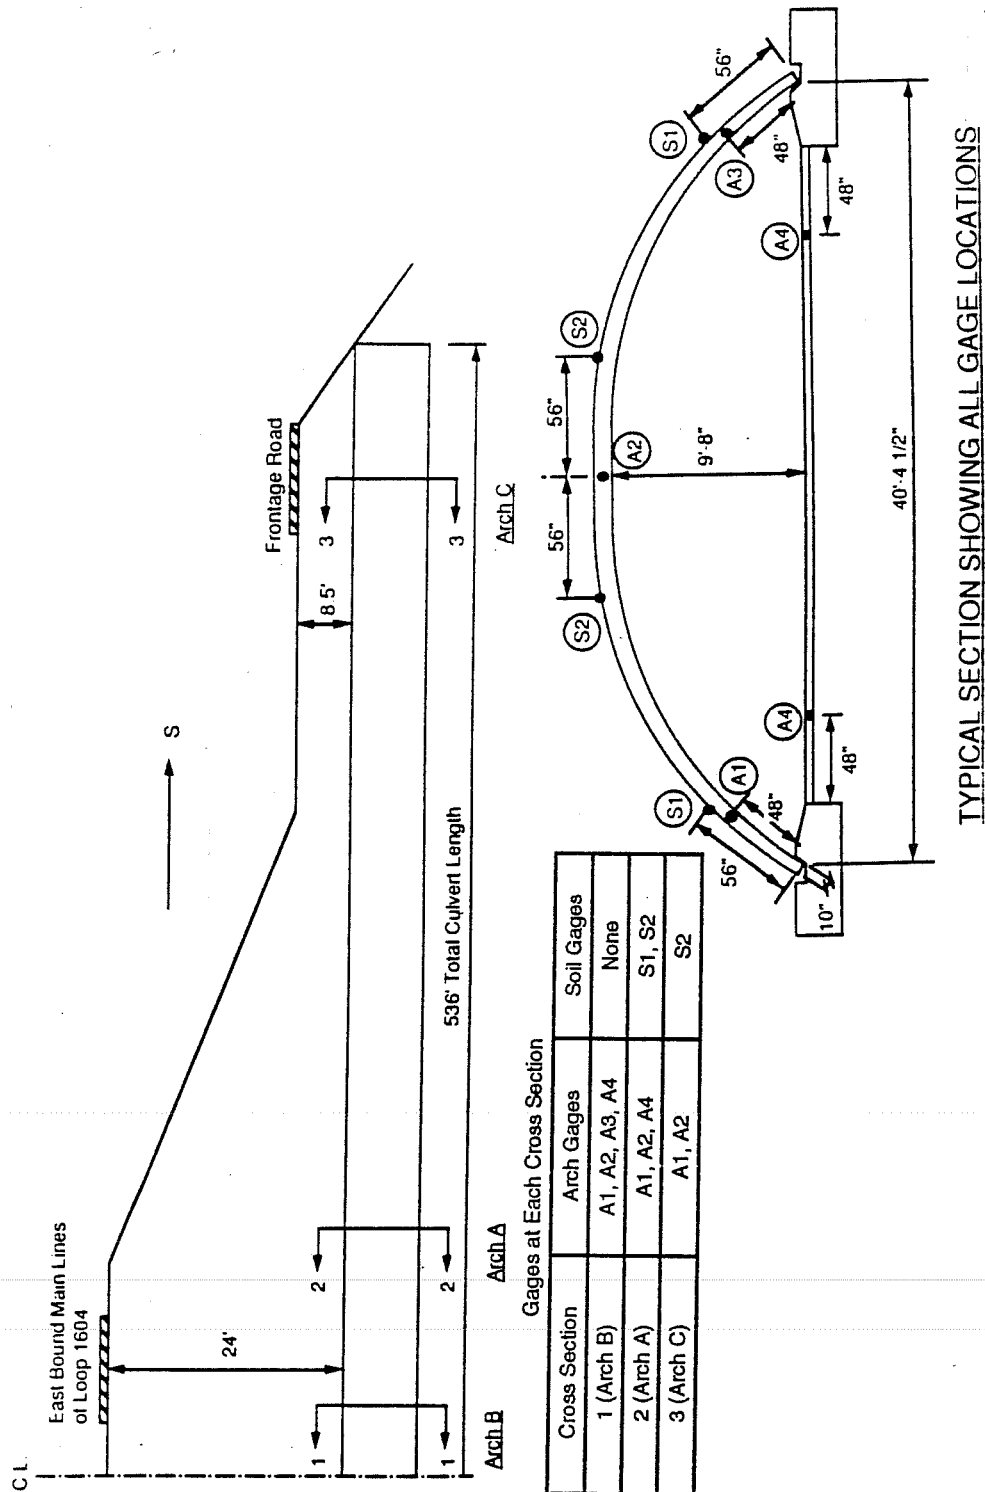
Elevation and section showing locations of soil pressure and strain gages
